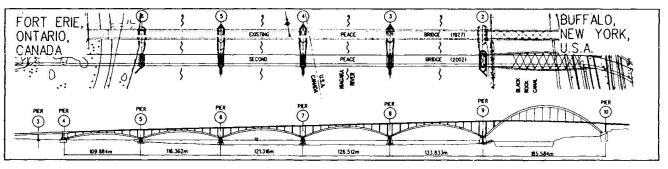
General Arrangement Showing Existing and New (Second) Peace Bridge.
